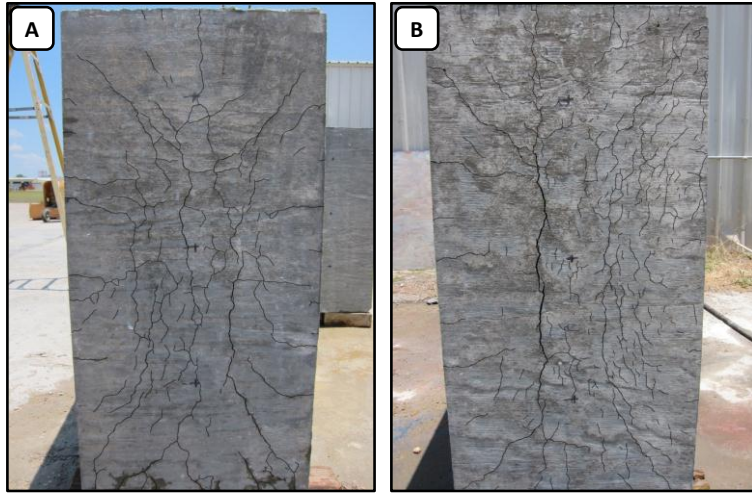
Cracking at Beam Segment Ends (A) Specimen 1 (B) Specimen 2
